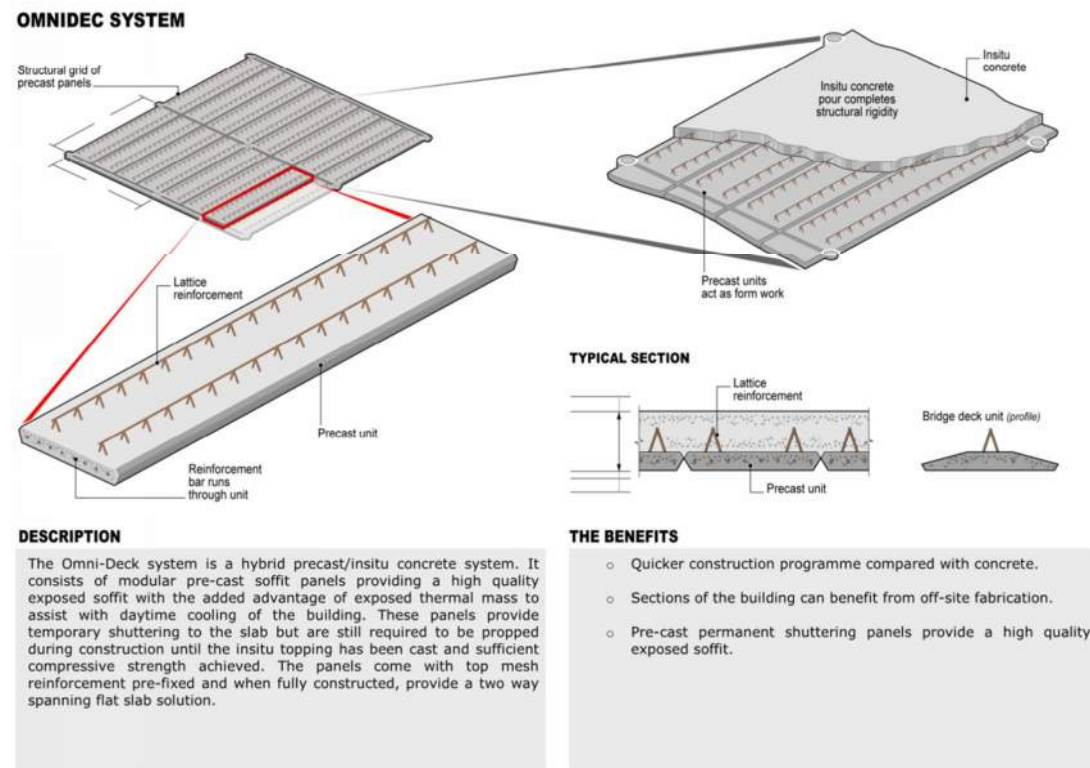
Structural Slab options –Omnia pre-cast concrete decks with structural topping (below)
